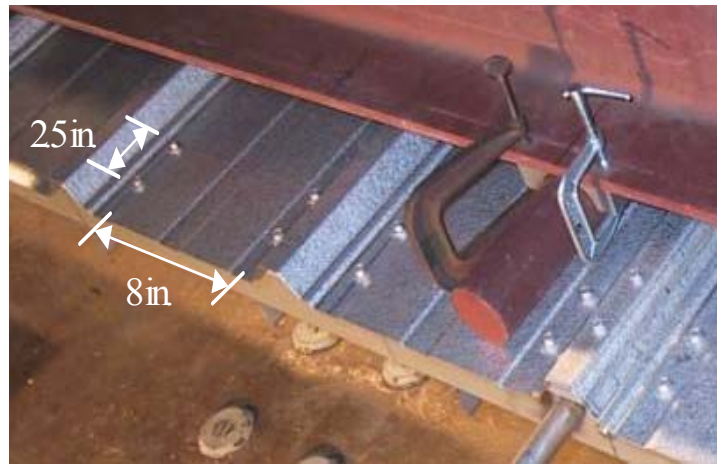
Selected standard panel-to-section and panel-to-panel fastener configuration (Z-section)
